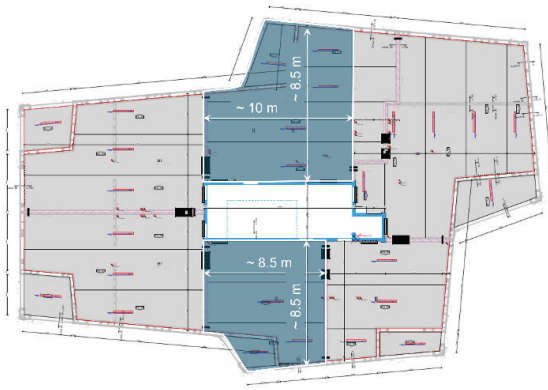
Floor plan with the segmentation of CLT plates layout and glued together using TS3 technology. Two statical floor slabs are marked to show the dimensions reached without additional static beams, Source: Timbatec Holzbaingenieure Schweiz AG
